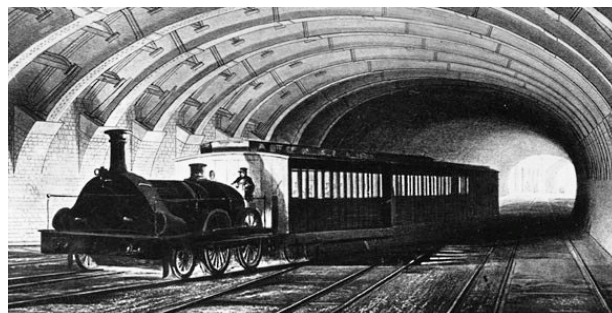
Historic subsurface tunnels of the London Underground [3]
